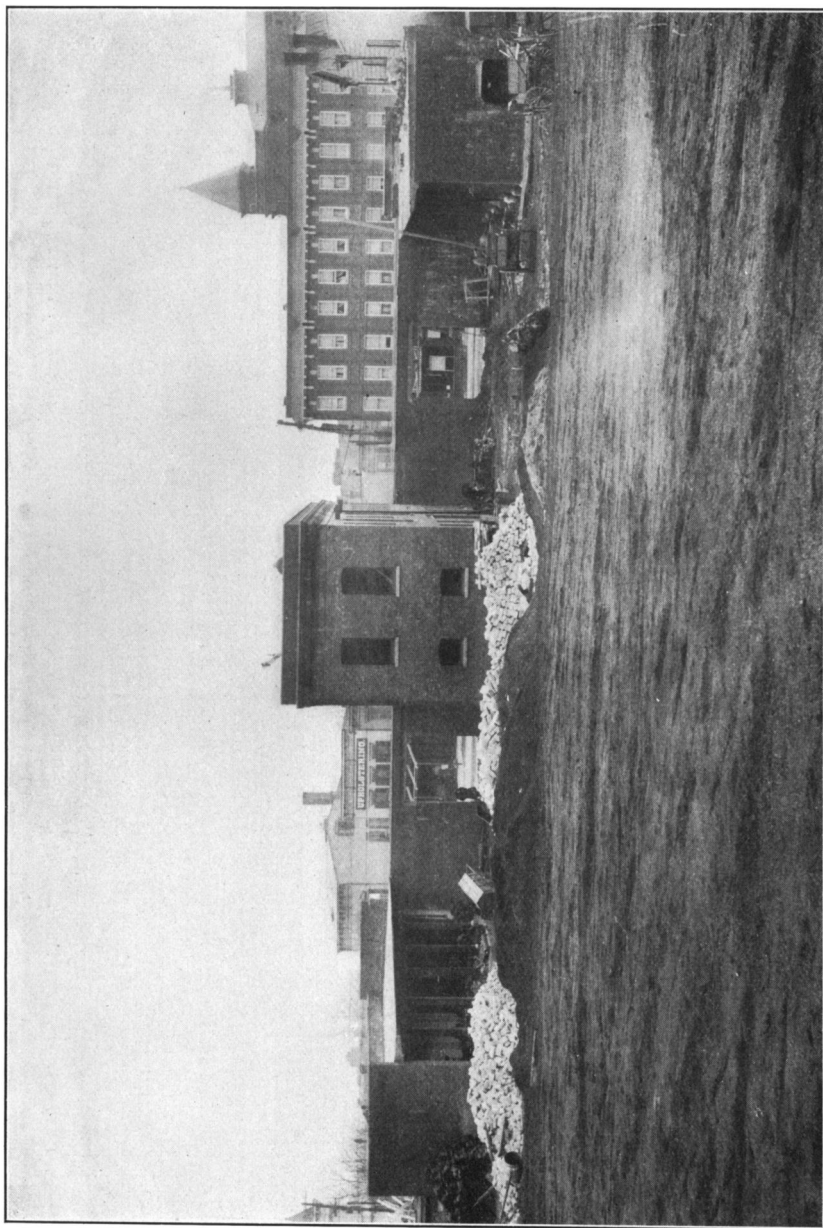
EAST NEW YORK REPAIR YARD, BOROUGH OF BROOKLYN, UNDER CONSTRUCTION. CENTRAL TWO STORY BUILDING TO BE USED FOR OFFICE, HEADQUARTERS FOR MEN, STOREROOM AND STABLE. ONE STORY SHEDS FOR STORAGE OF WAGONS, AUTOMOBILES, HYDRANTS, VALVES AND HEAVY MATERIAL
